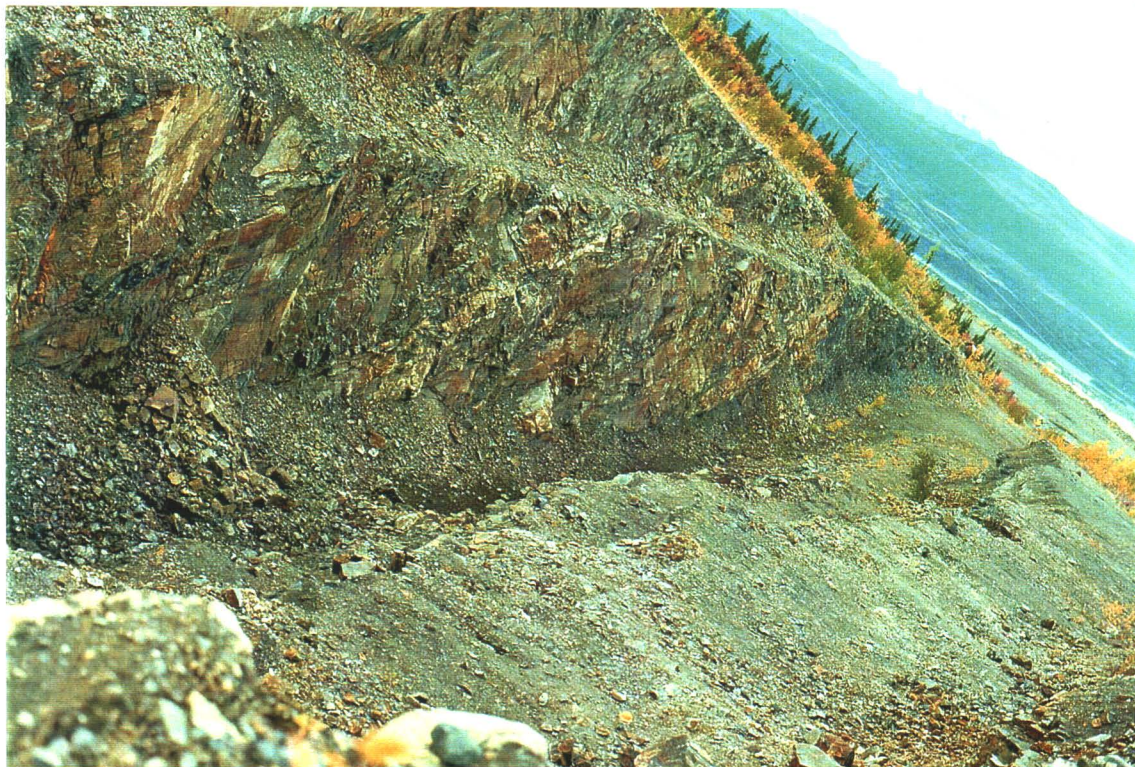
#35 Vein Pit. Note steep pit walls.
